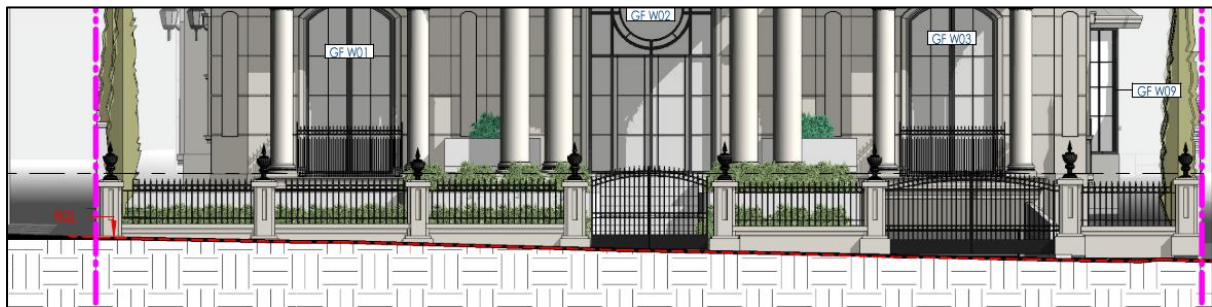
Excerpt from submitted Streetscape Analysis Plan
